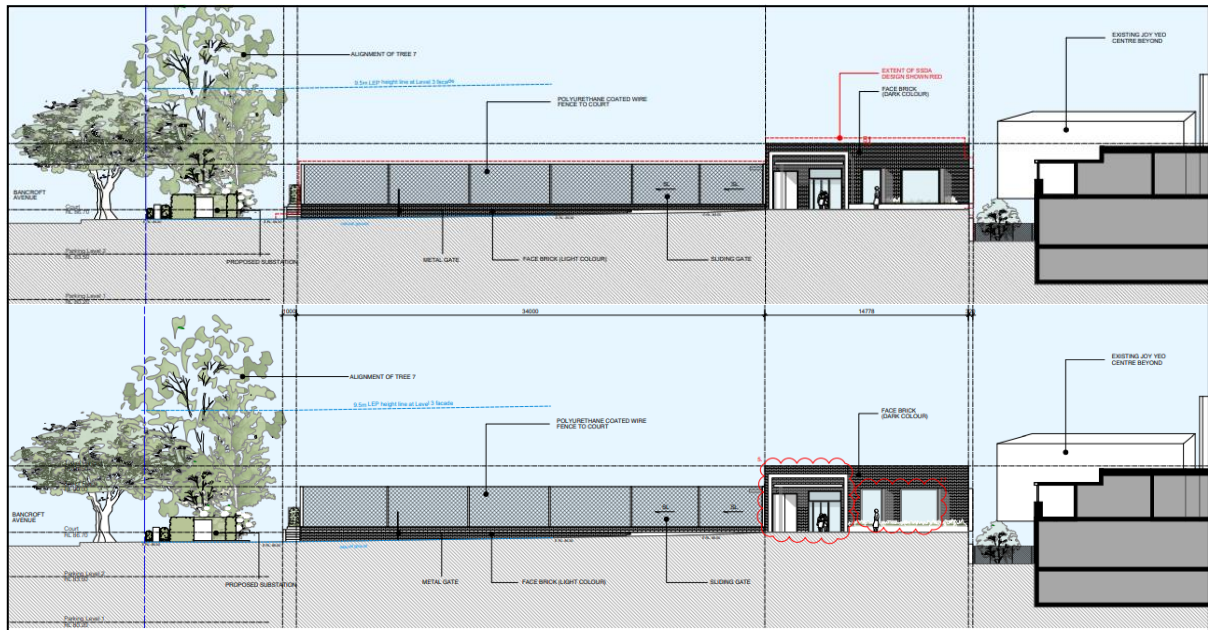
| Approved (above) and proposed (below) west elevation (Source: SSD-9912 and Applicant's Modification Report 2022)
